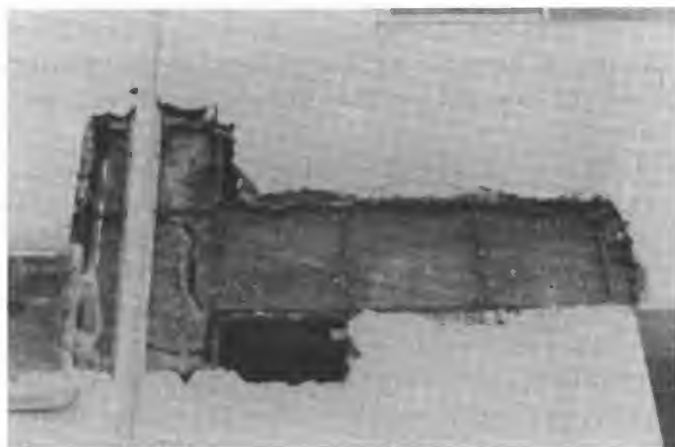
Holiday Inn, Marengo Street. Exterior view of damage to beam-column joint at the intermediate stair landing. General Adjustment Bureau photograph.
